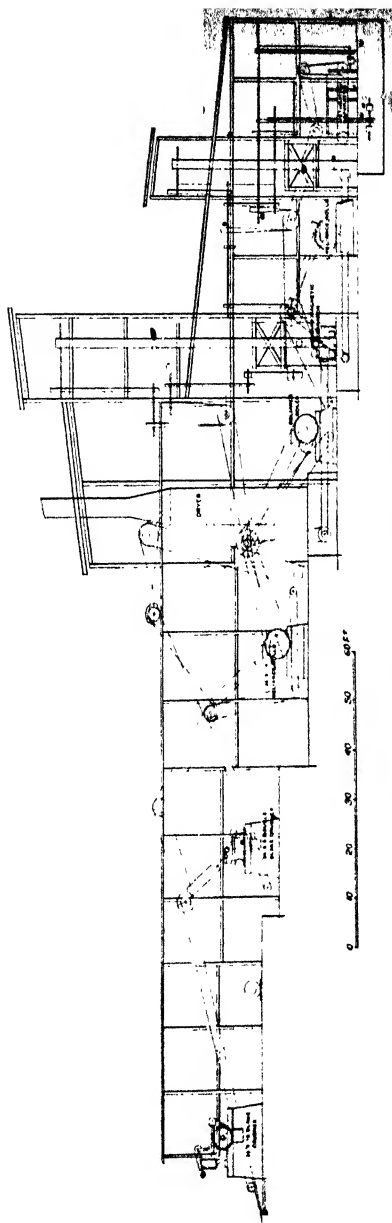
Lake Champlain magnetic separator plant. Sectional elevation.
